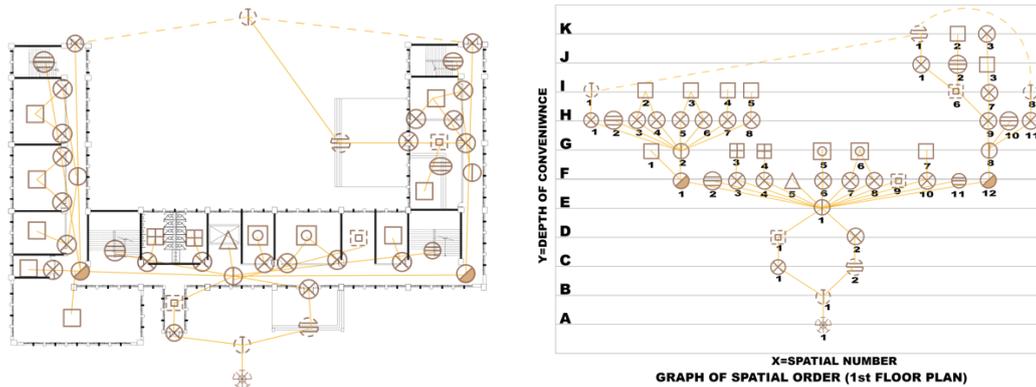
1st floor plan of Daitou Elementary School (Left) and Spatial hierarchy (Right)
